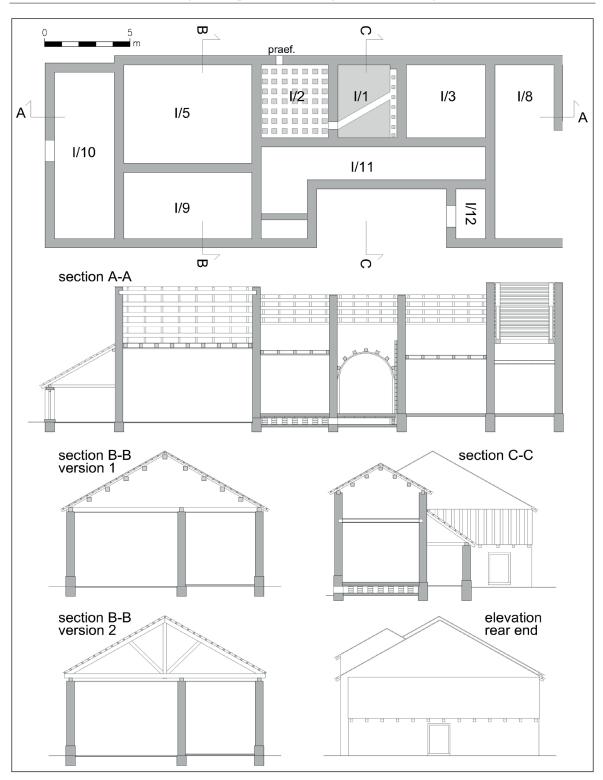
Possible sections for House I/a (Drawing: L. Dobosi).
